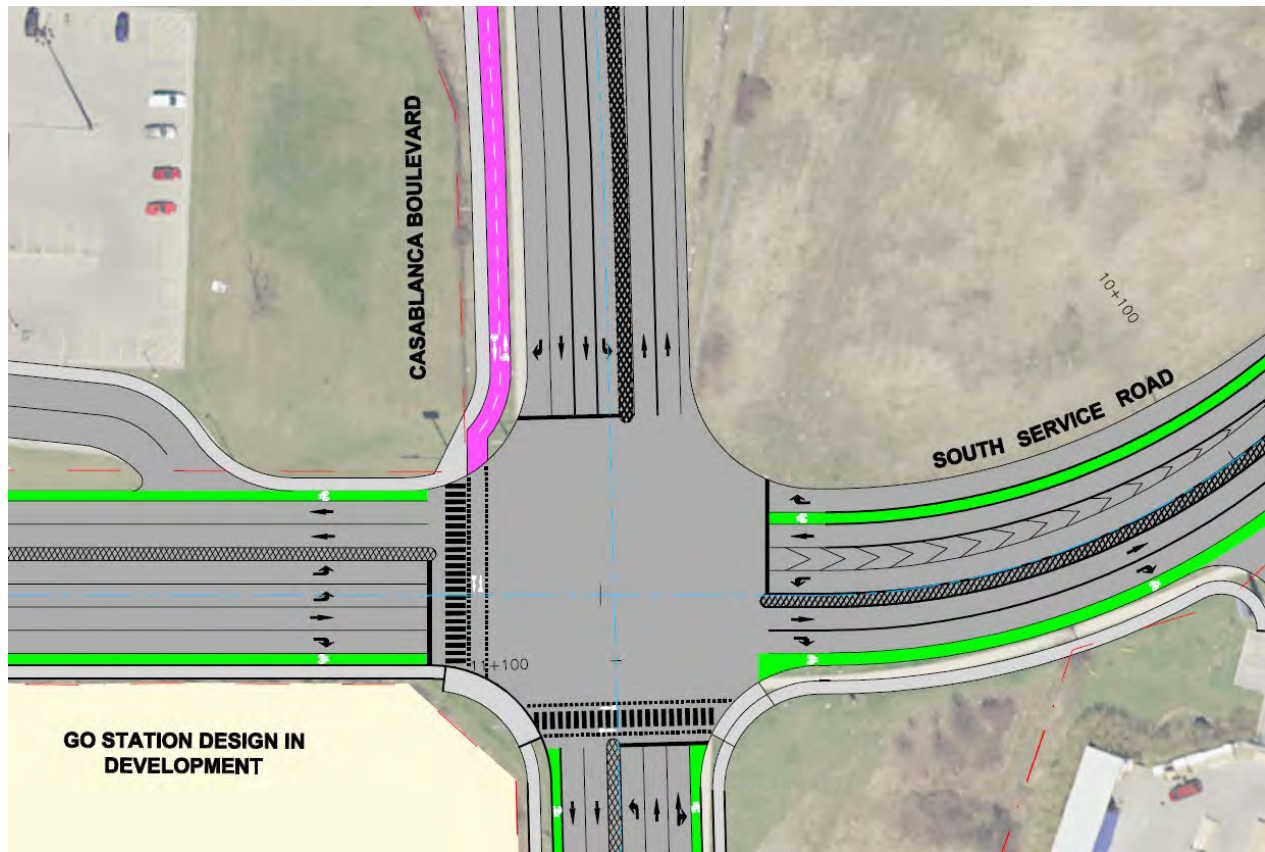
Casablanca Boulevard/South Service Road Intersection
